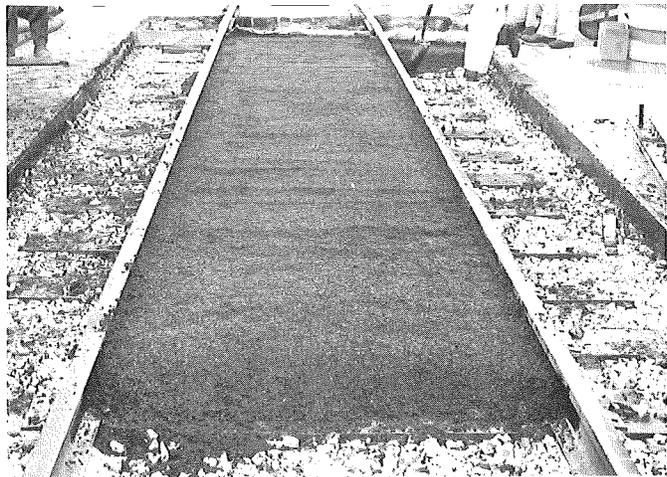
Placing wearing surface consisting of epoxy mixed with rubber buffings.
